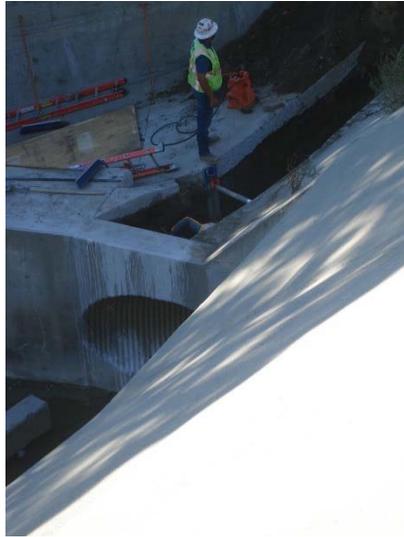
Terminal Basin San Fernando Road Exterior Wall: September 12, 2017
